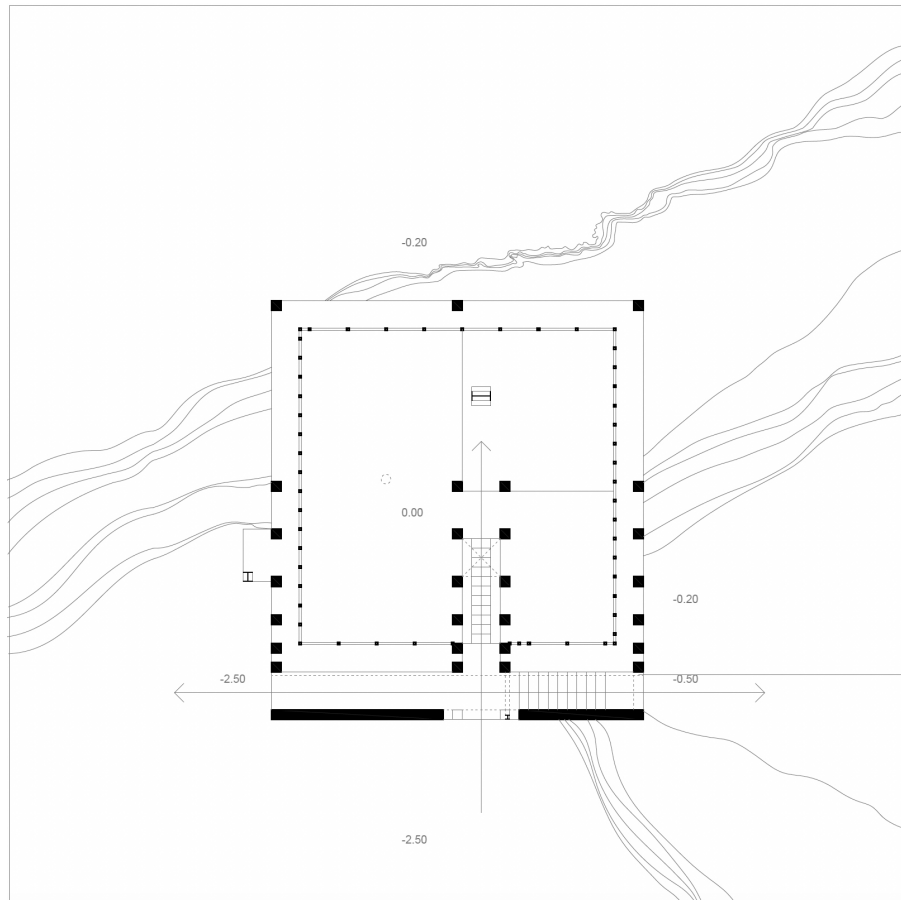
Interpretation of the pavilion site plan. (Author's image.)
